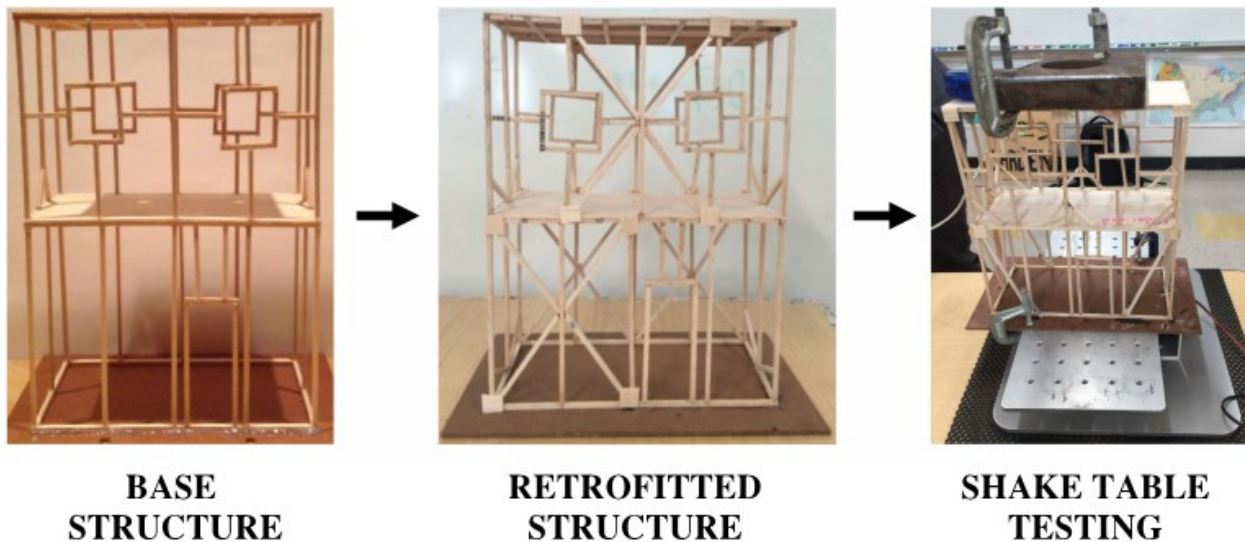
Balsa Wood Structures for High School Design Challenge
